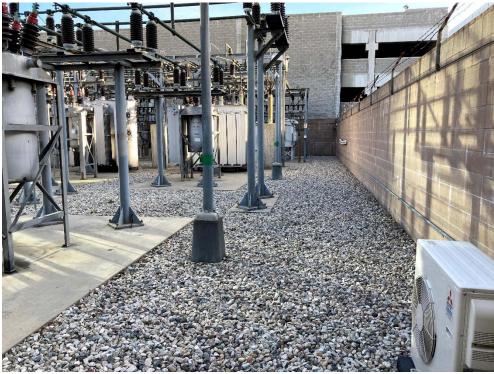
The yard area was mostly gravel with concrete equipment footings and walkways. The view is to the east from the southwestern corner.
